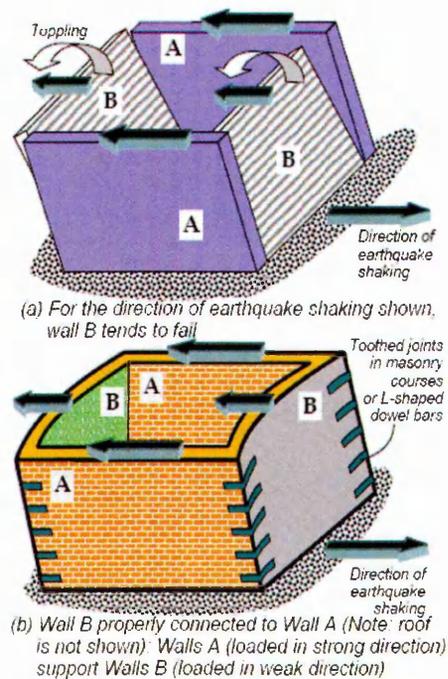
Advantage sharing between walls – only possible if walls are well connected (IITK-BMTPC, 2003)
